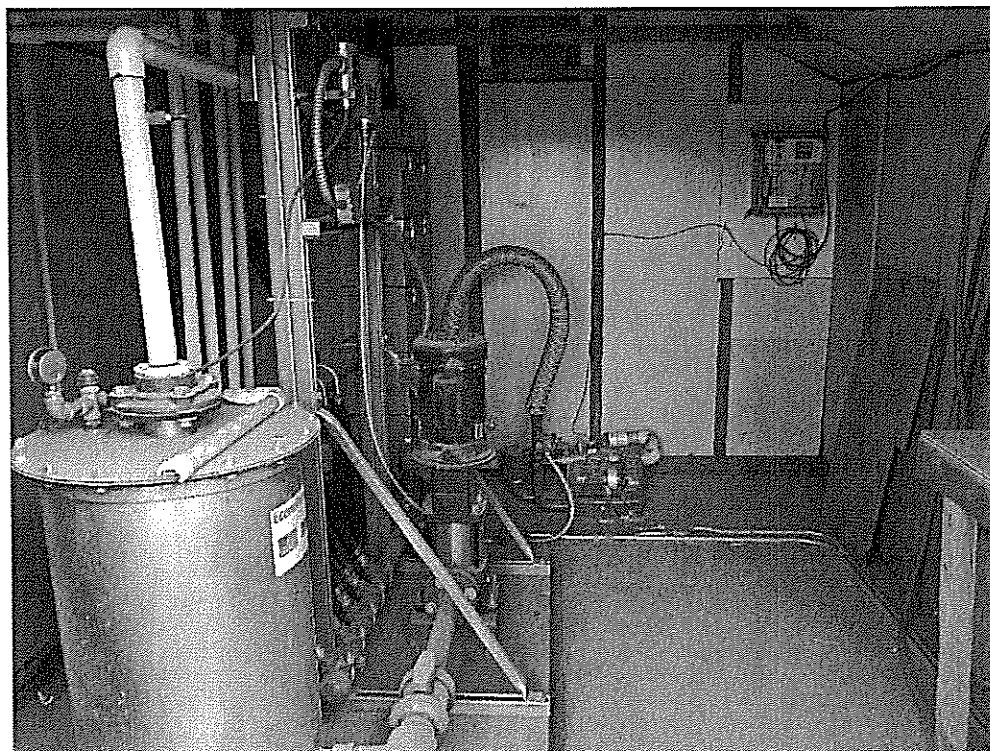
/ P1020221 – View inside the treatment building. A piece of cracked PVC plumbing appears on the left.
